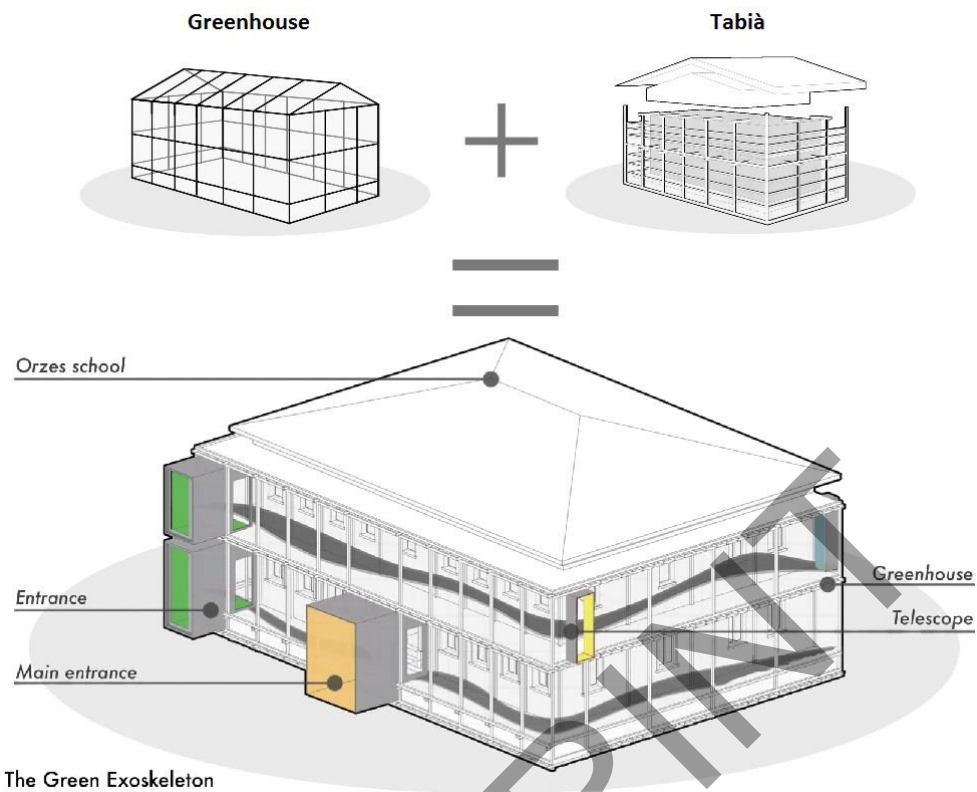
Orzes school new appearance obtained by the combination of a wood Tabià and a glass greenhouse to create an outside extension on original façade for production and thermal insulation (The Green Exoskeleton).
